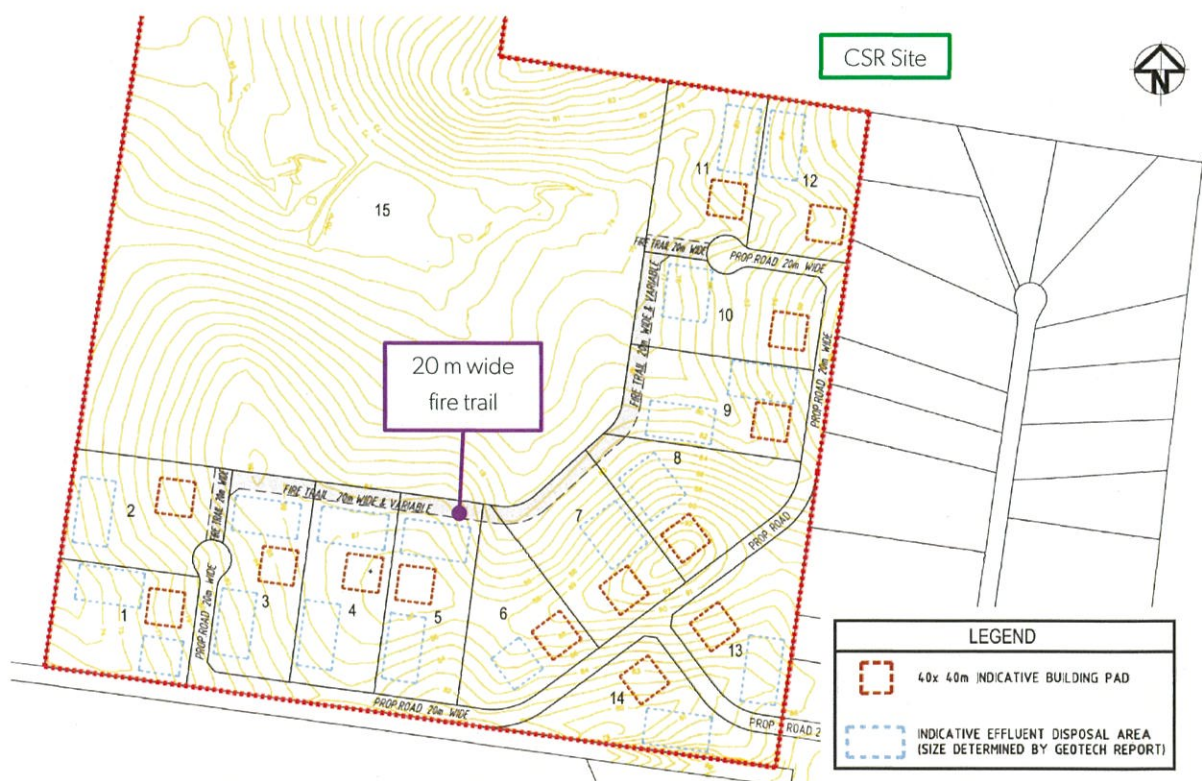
| Proposed Indicative Building Pads Plan under DA19/0785
